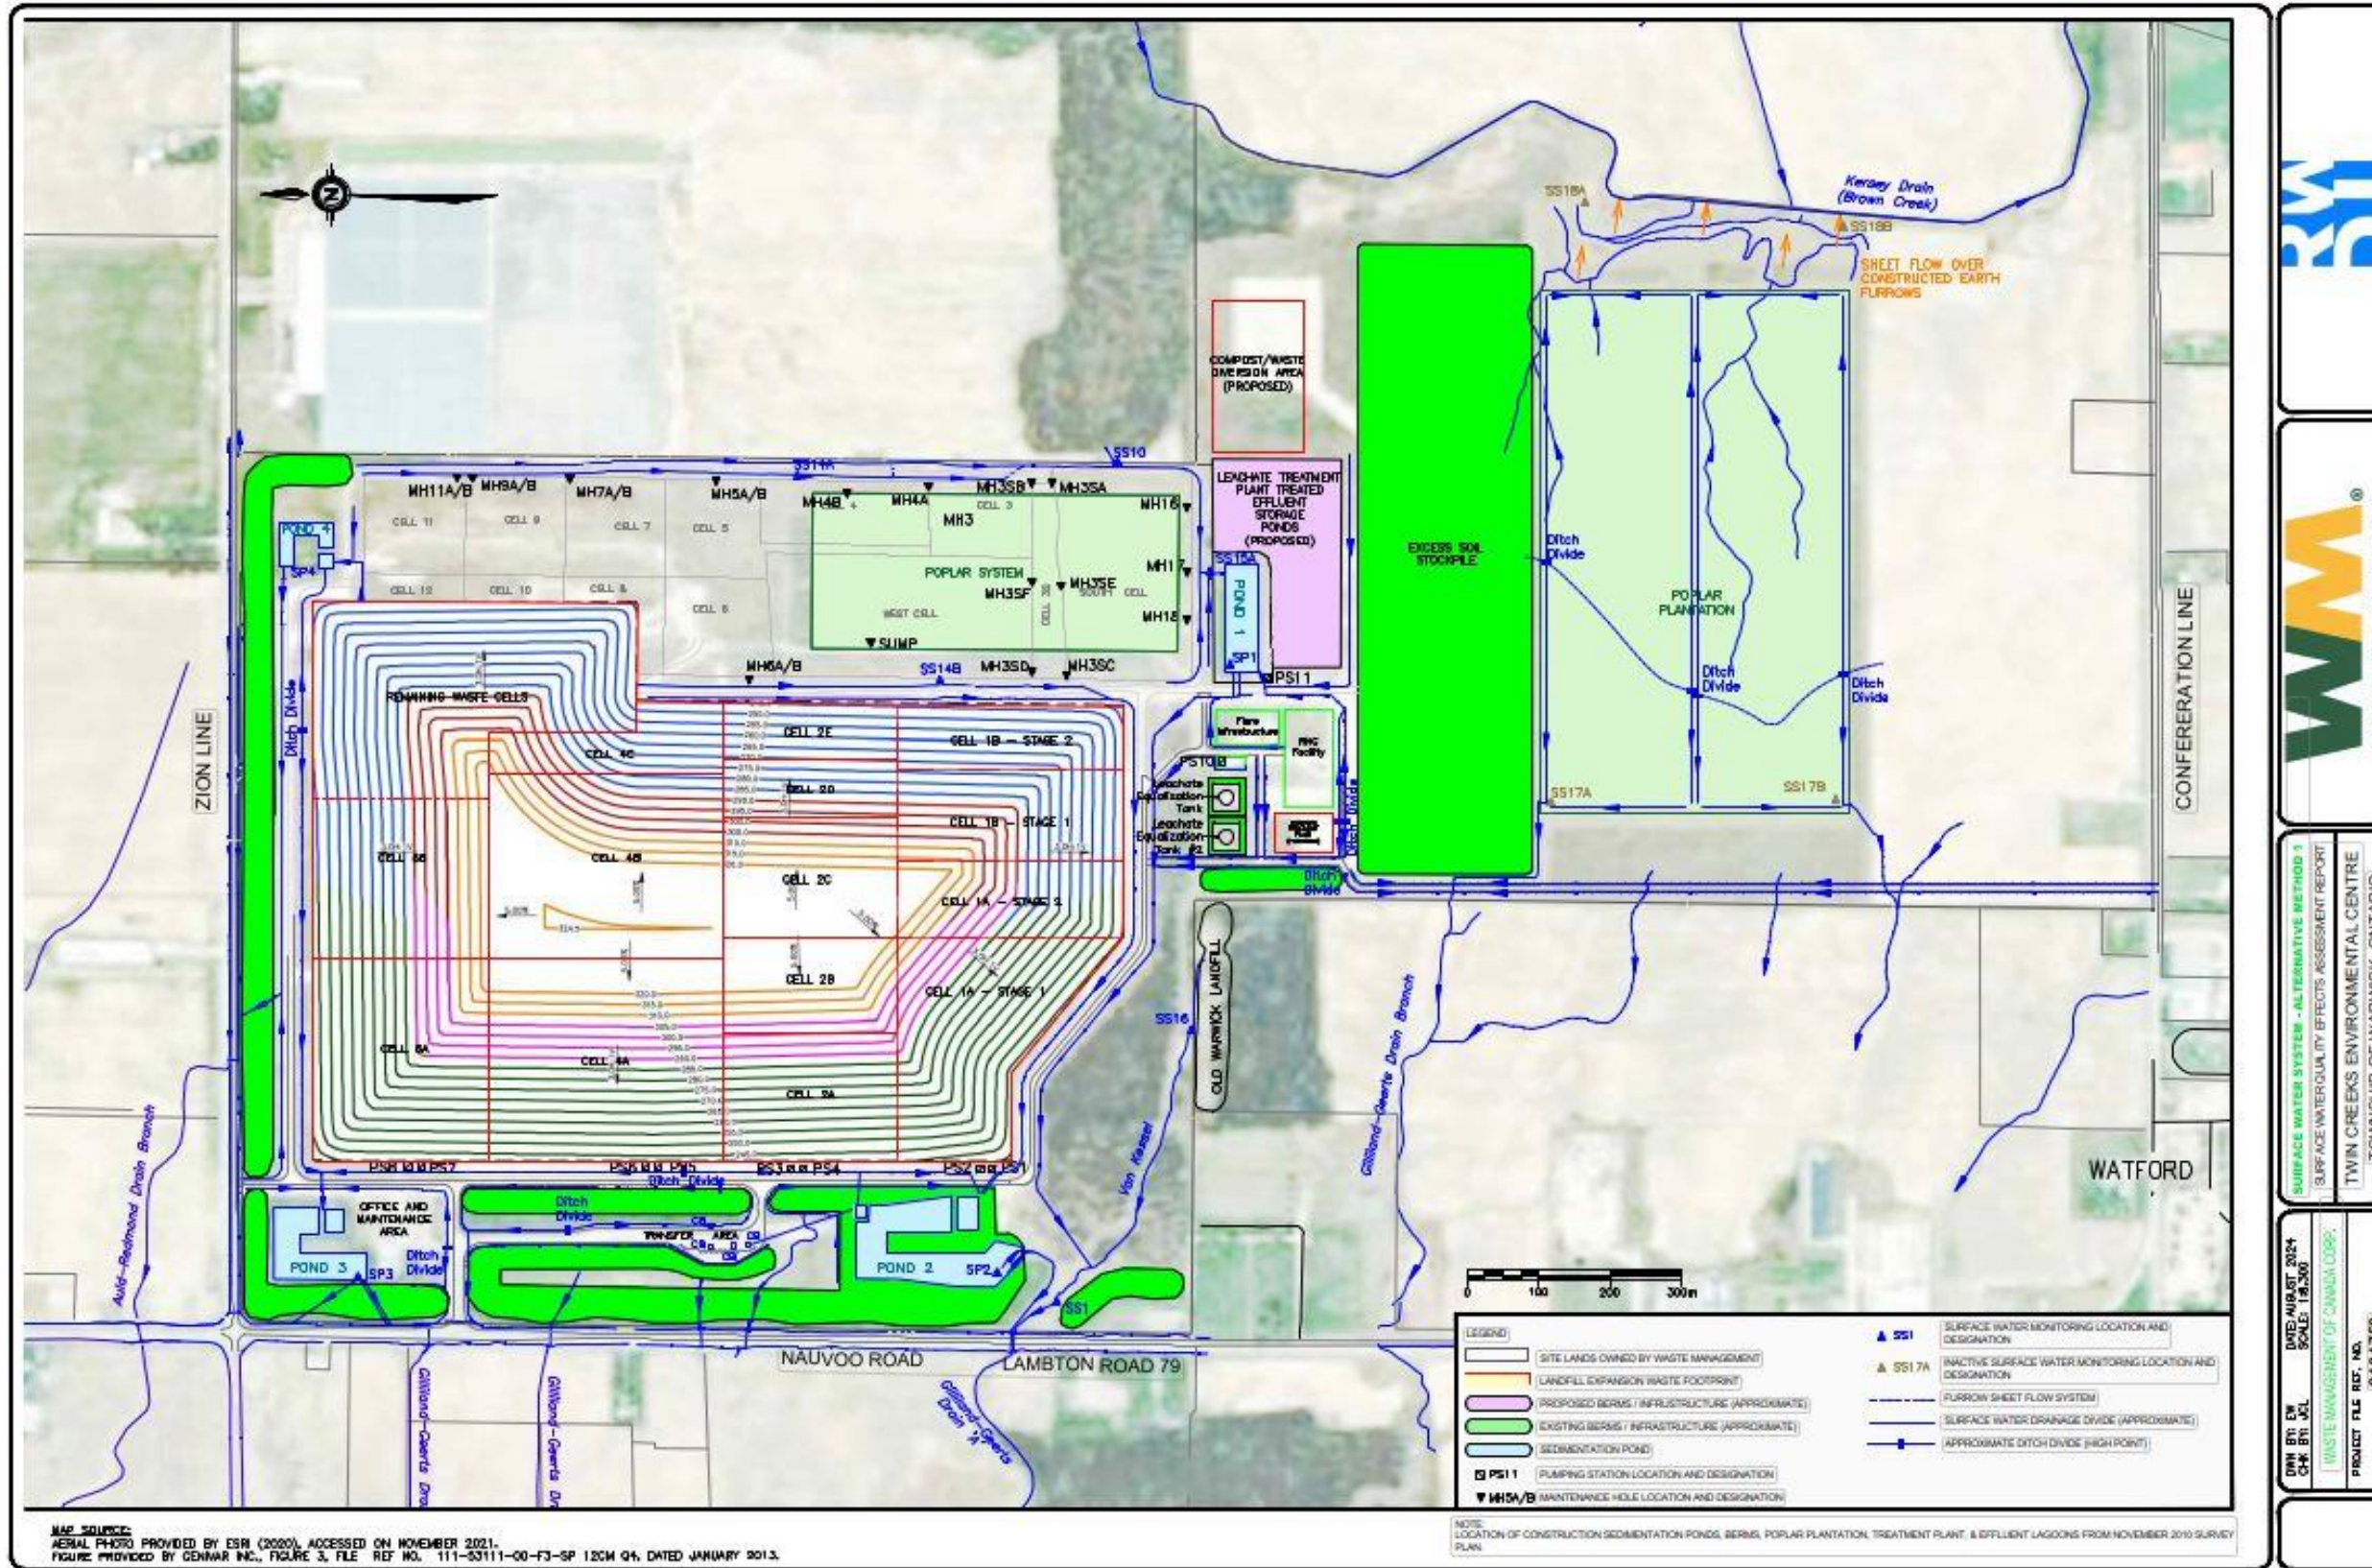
Alternative Method 1 Proposed Landfill Contours on Surface Water Drainage Network Site Plan
